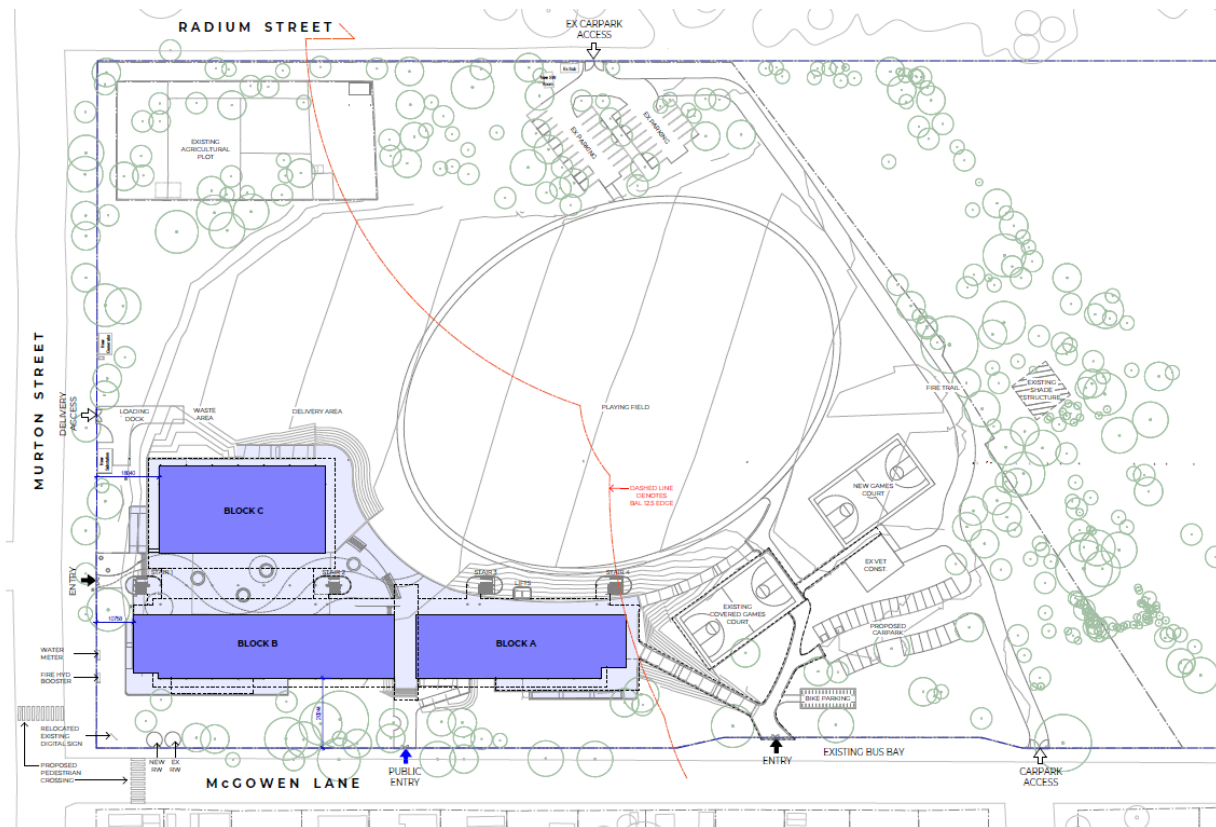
Proposed access, traffic and parking arrangements (Source: Woods Bagot)
